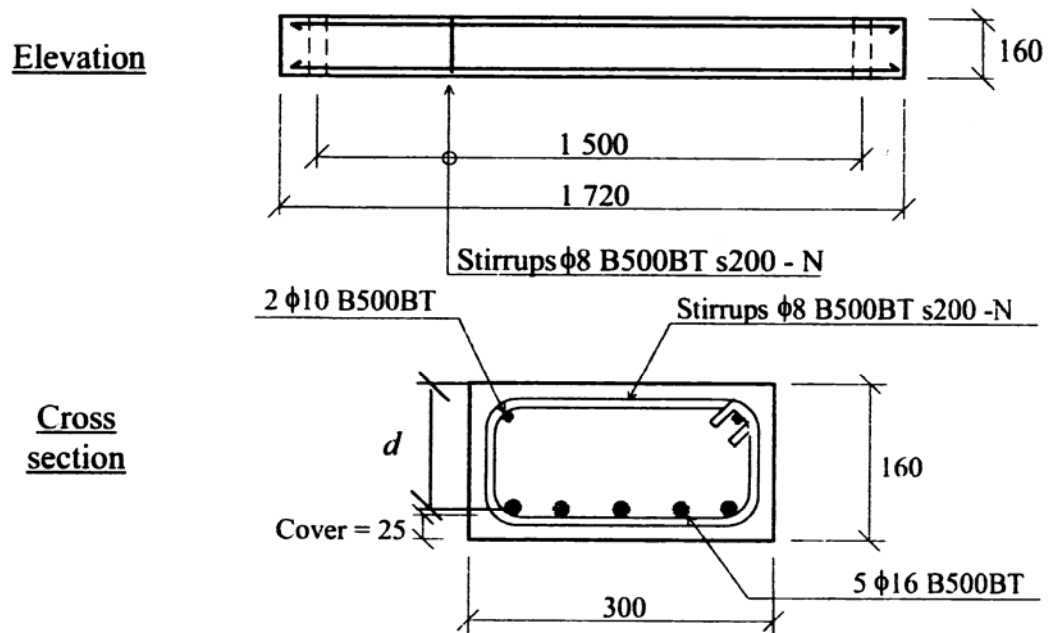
Elevation and Cross-Sectional of the Beam with Dimensions in mm.
